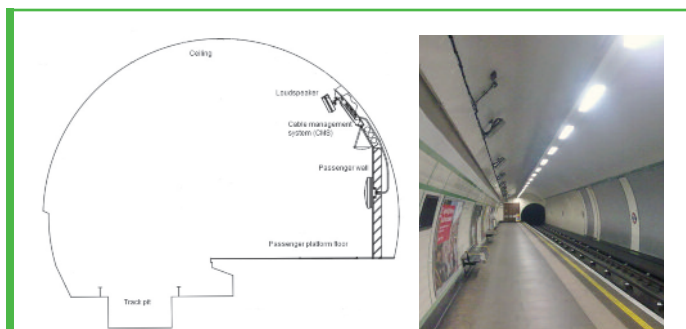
London Underground station subsurface platform cross section representation (left) and corresponding actual platform space.
